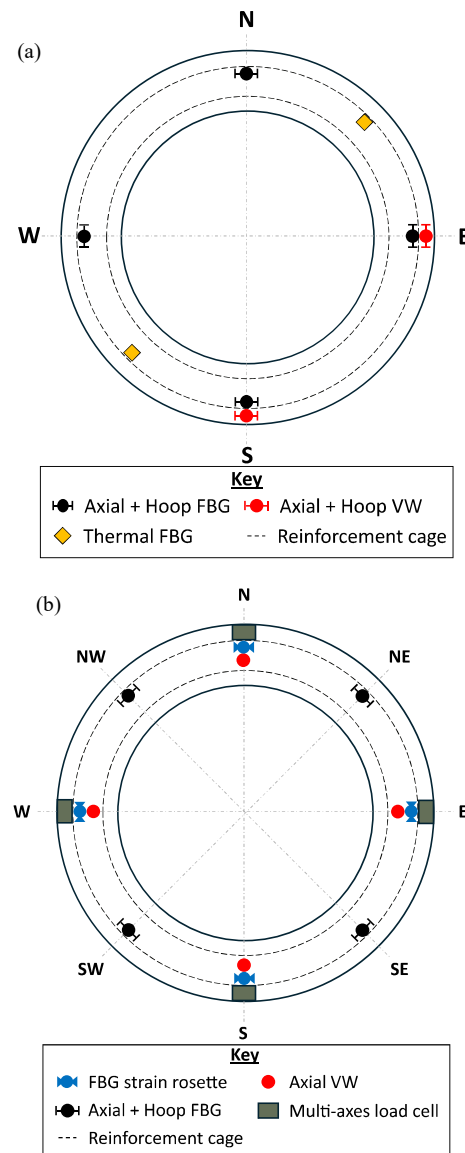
Instrument layout (a) IP1, and (b) IP2.
